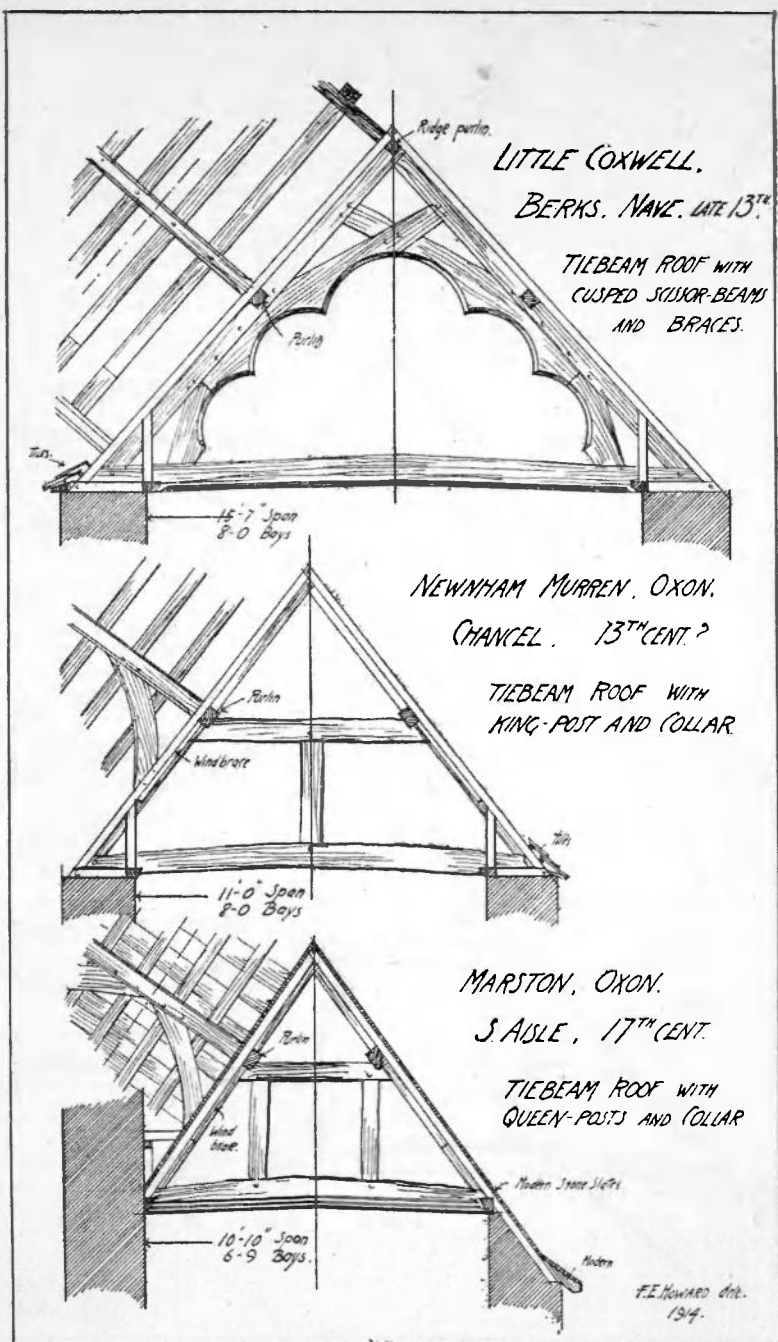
TIE-BEAM ROOFS WITH SCISSOR-BEAMS OR KING-POSTS.
